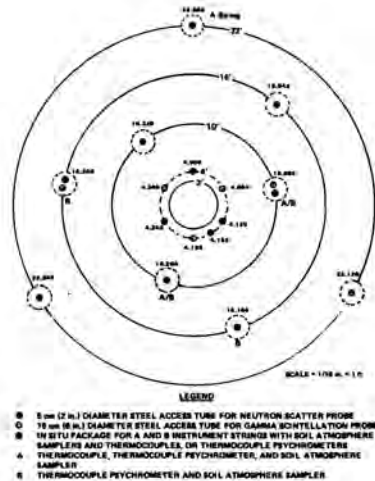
PLAN VIEW GDF BOREHOLE AND INSTRUMENTATION MONITORING SYSTEM
